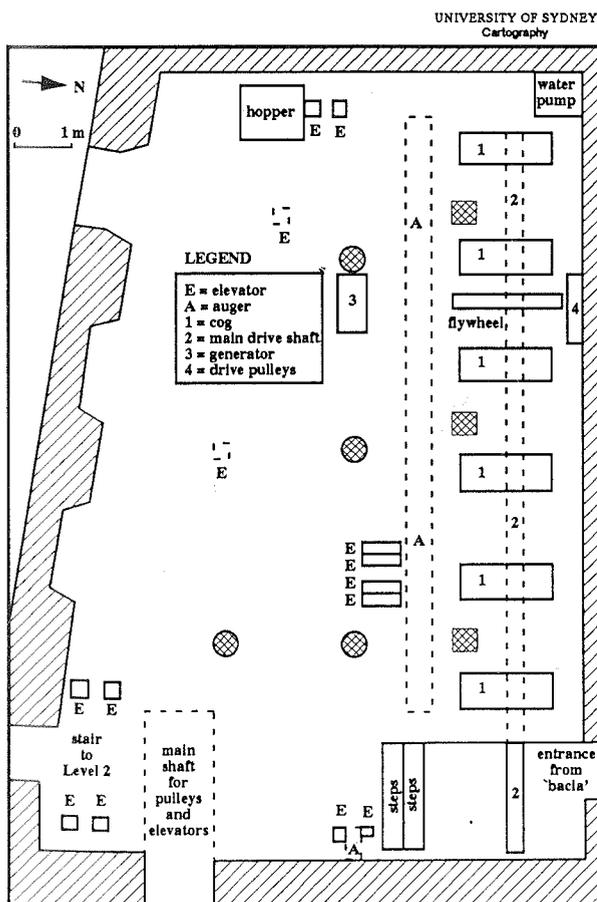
Plan of the ground floor of A Nabantina flour mill. Plan by Roger Parris.
